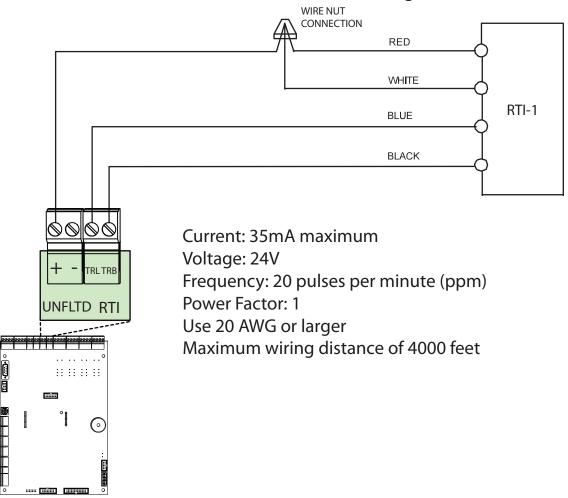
RTI-1 Common Remote Trouble Indicator Wiring
